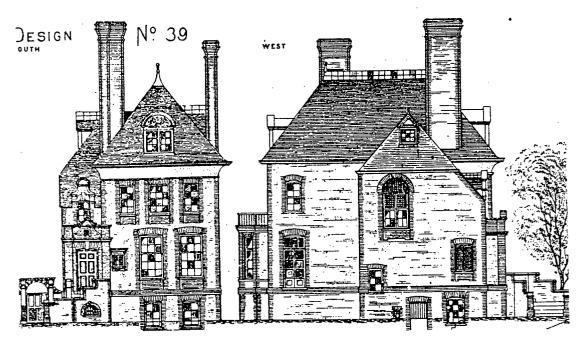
J. M. Brydon, Houses at Spring Bank, Haverstock Hill. (American Builder, 1875).
